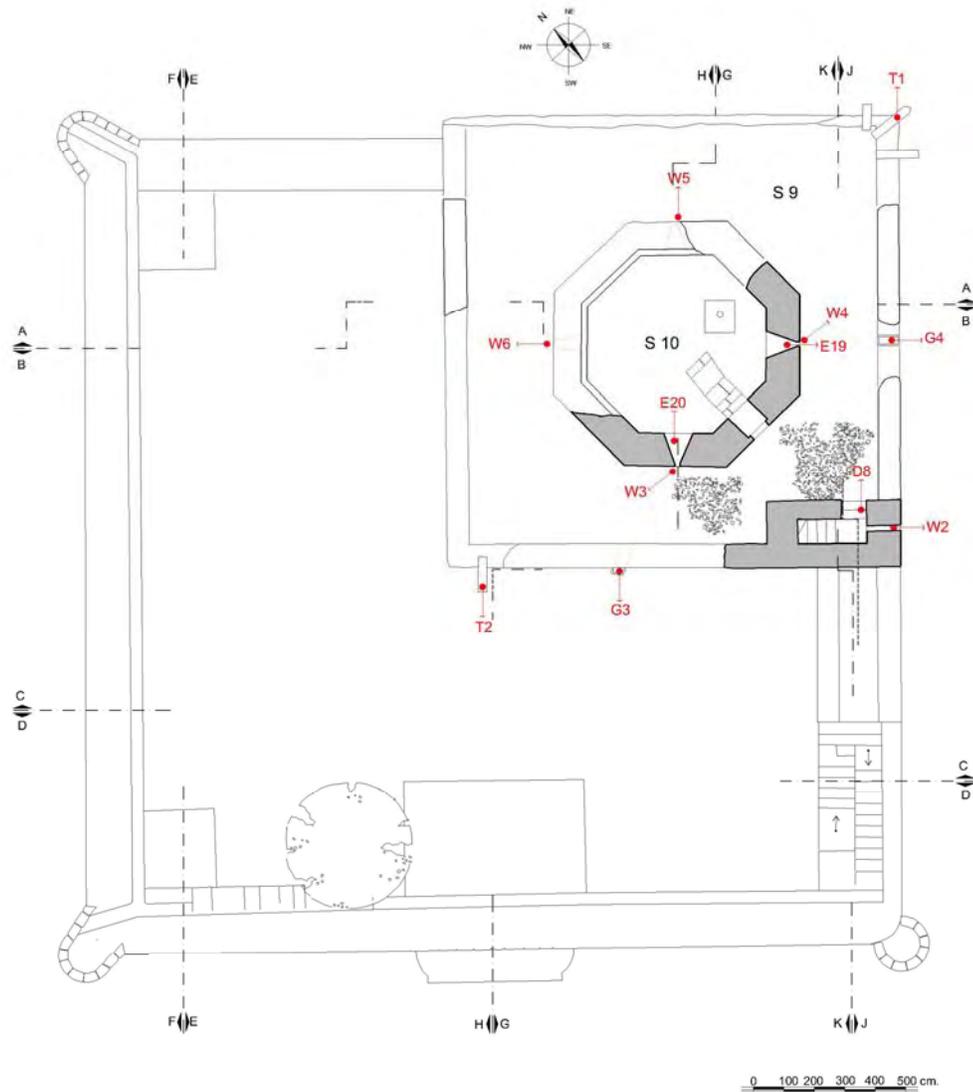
Key Plan- 2<sup>nd</sup> Floor.
